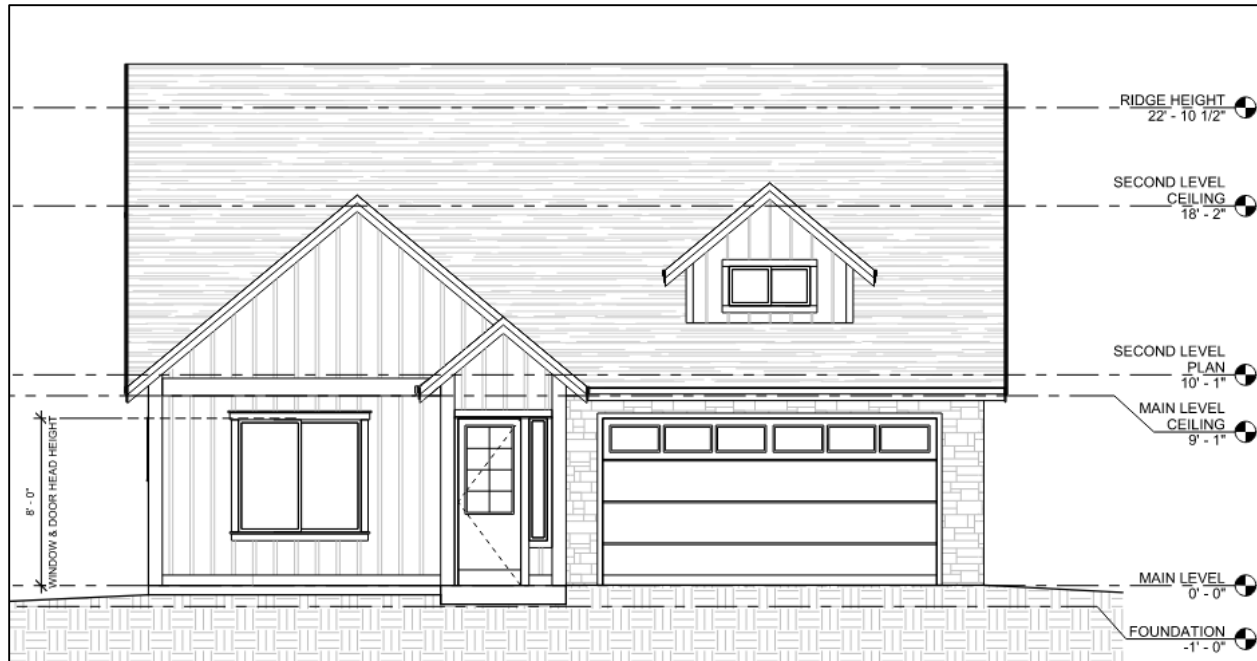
Front Façade Building Elevation for New Unit (Lot 1)
